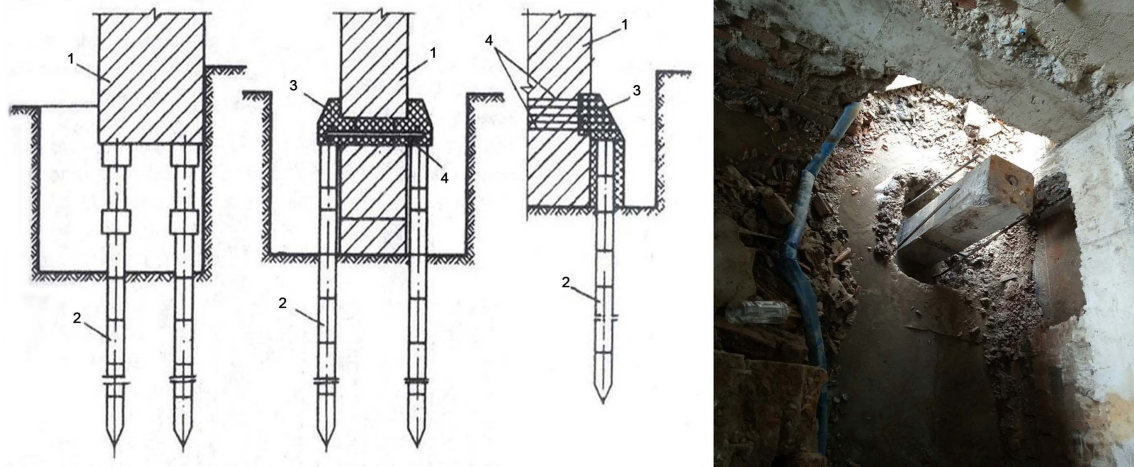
Solutions to reinforce the foundation with reinforced concrete piles. In Figure 7: 1—foundation; 2—steel concrete pile; 3—steel concrete beams; 4—steel concrete braces.
